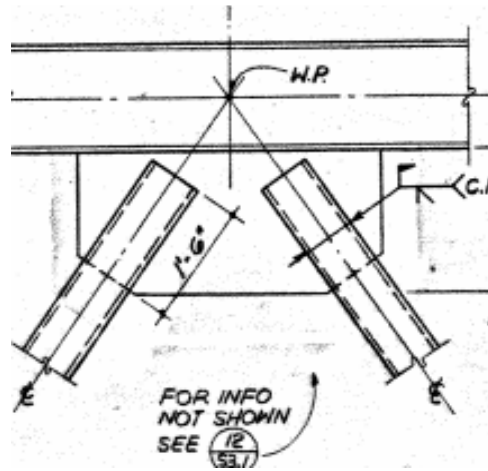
Top Connection Detail (83CA3A--P-1415-3)
